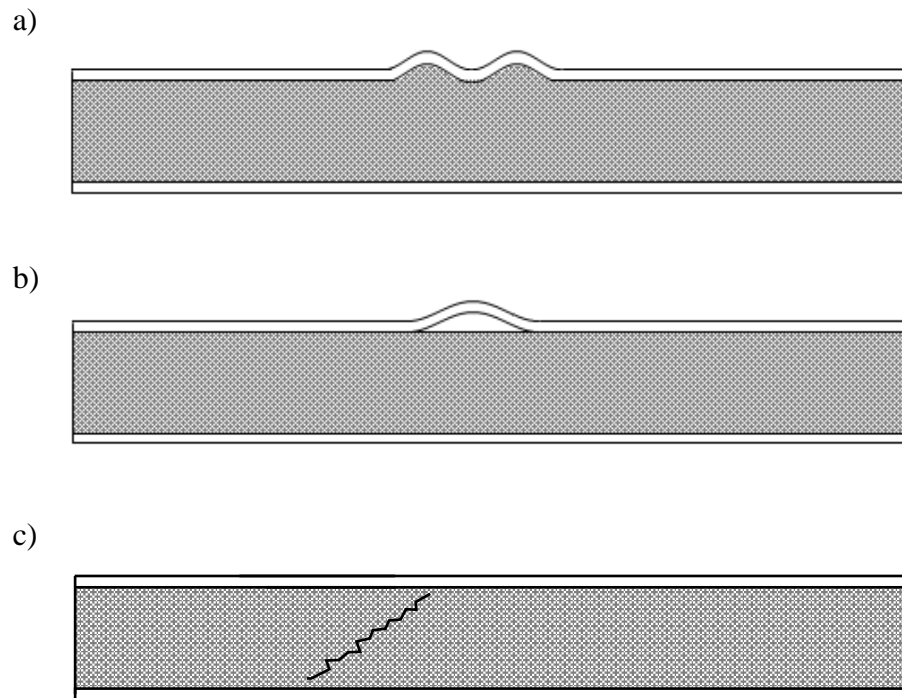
Examples of typical failure modes in sandwich panels in bending: a) facing sheet wrinkling; b) facing plate delamination; c) shear failure of core.
